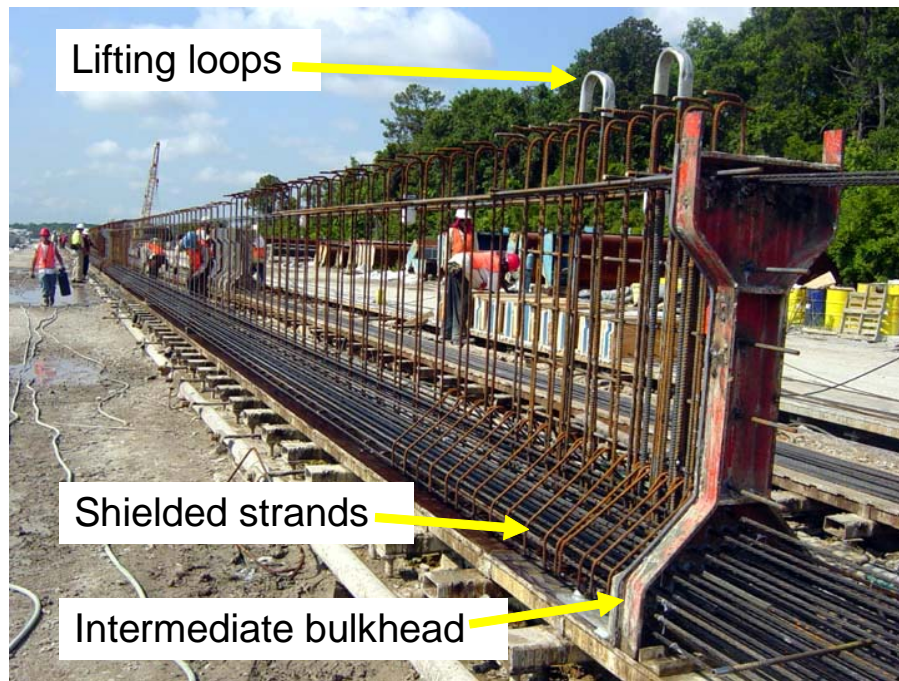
Precast I-Girder (Type IV) Fabrication
